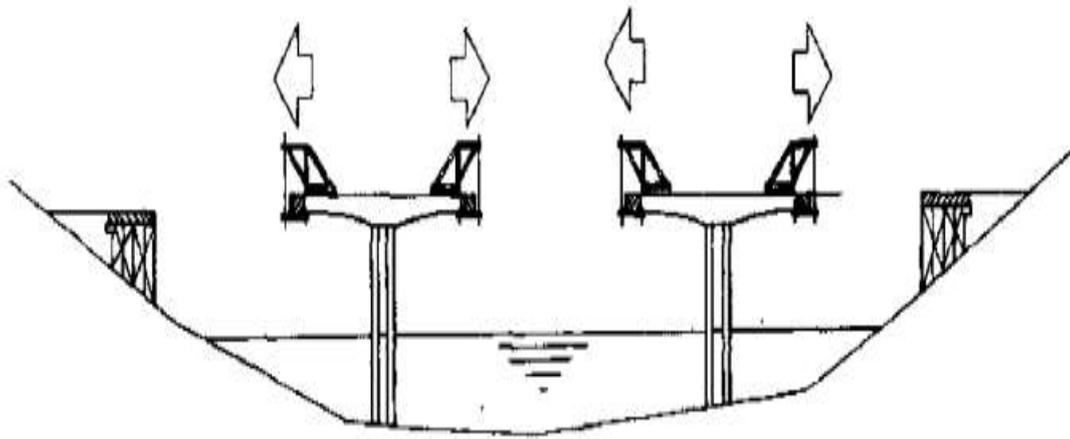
Continuous rigid frame box girder cantilever construction sketch
